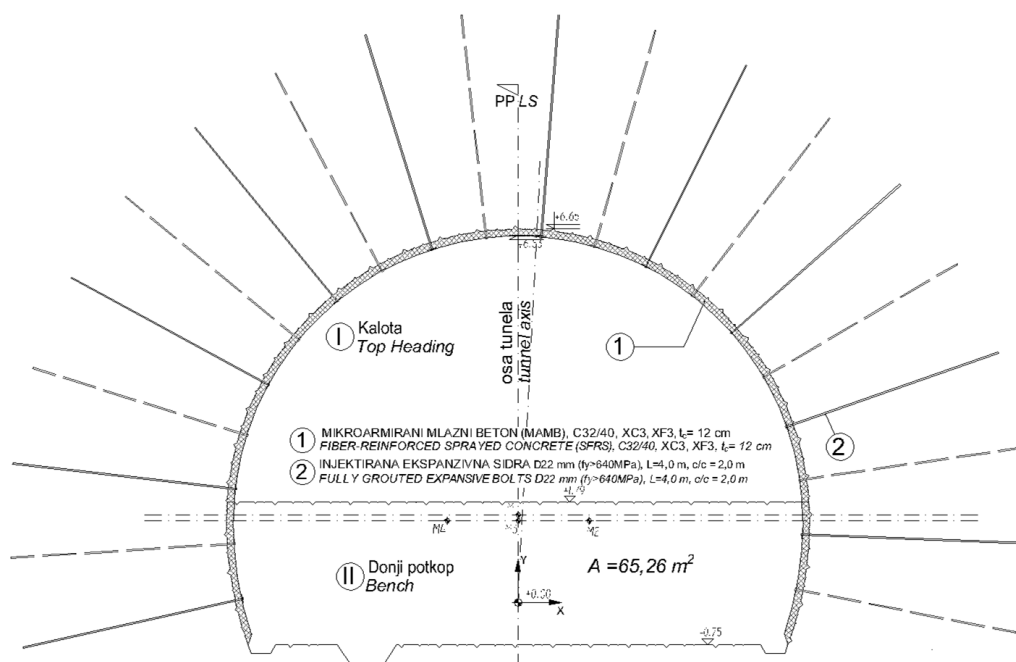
Typical cross-section of the tunnel with the single-layer lining system
